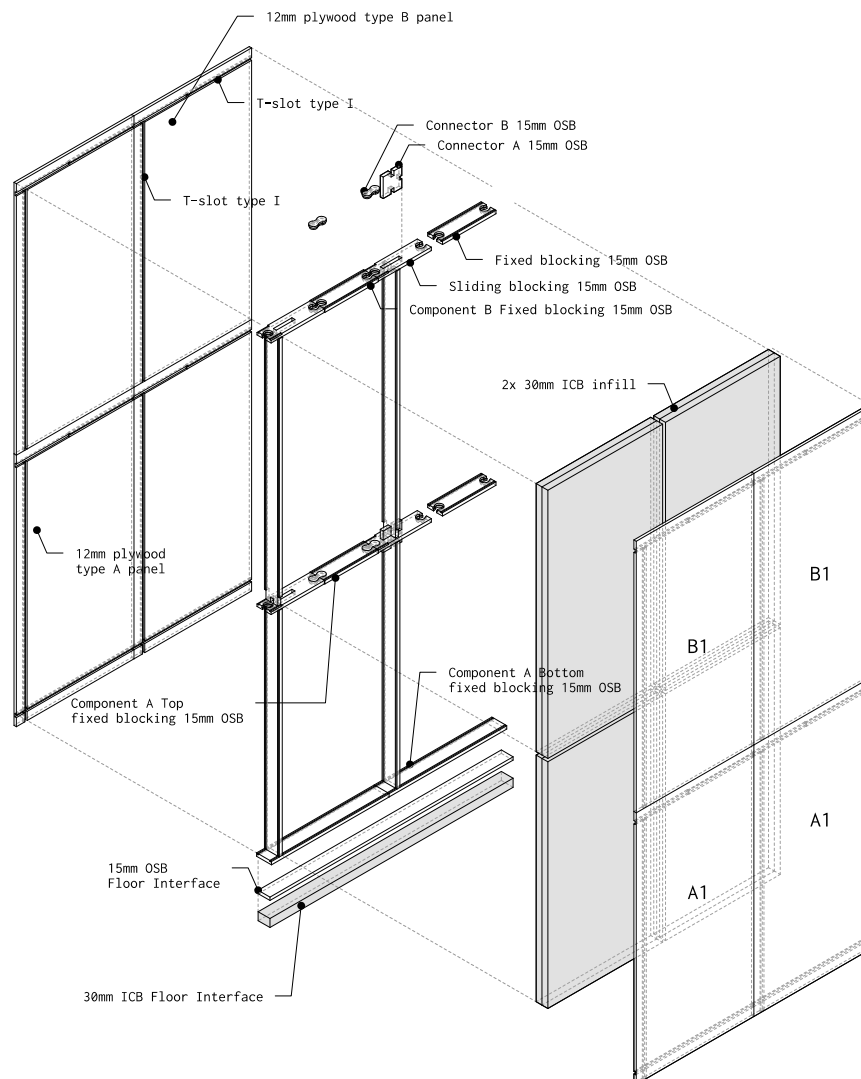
Exploded axonometric view of four ORW v2.2 components
